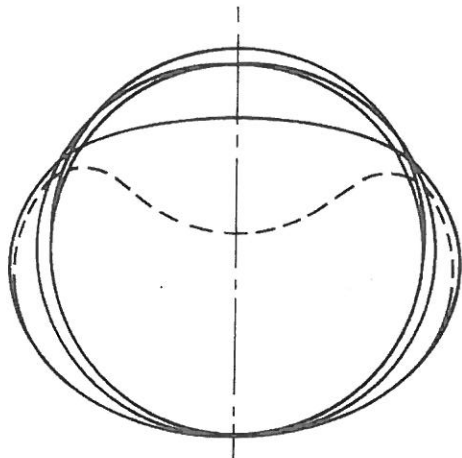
Stages of deflection of a flexible-pipe culvert.
